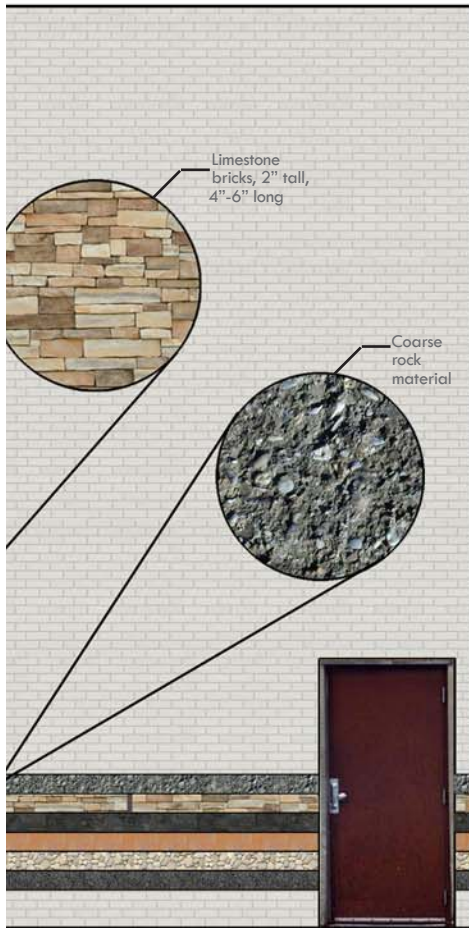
Detail of sensory wall and crosswalk of Amanda Arnold Elementary Building (author 2012).
